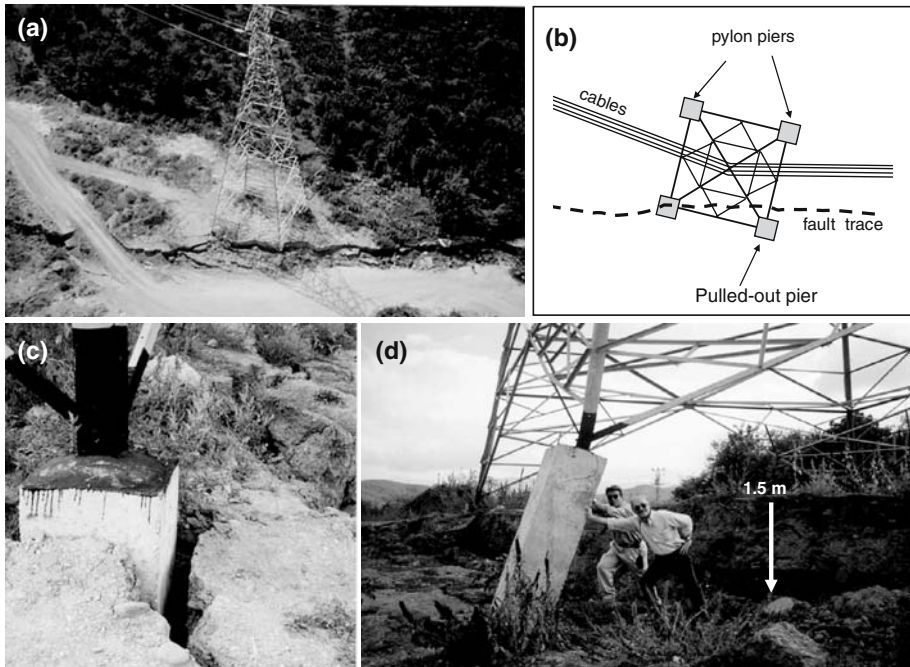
High Voltage Pylon; Minor Damage: (a) aerial photo (adapted from Youd et al. 2000), (b) plan-view sketch of the pylon and the fault rupture, (c) photo of the directly-hit left foundation pier, and (d) photo of the pulled-out right foundation pier
